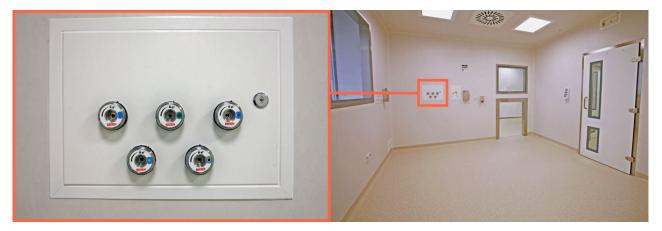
Gas Outlet Enclosure (5No outlet type Enclosure)
